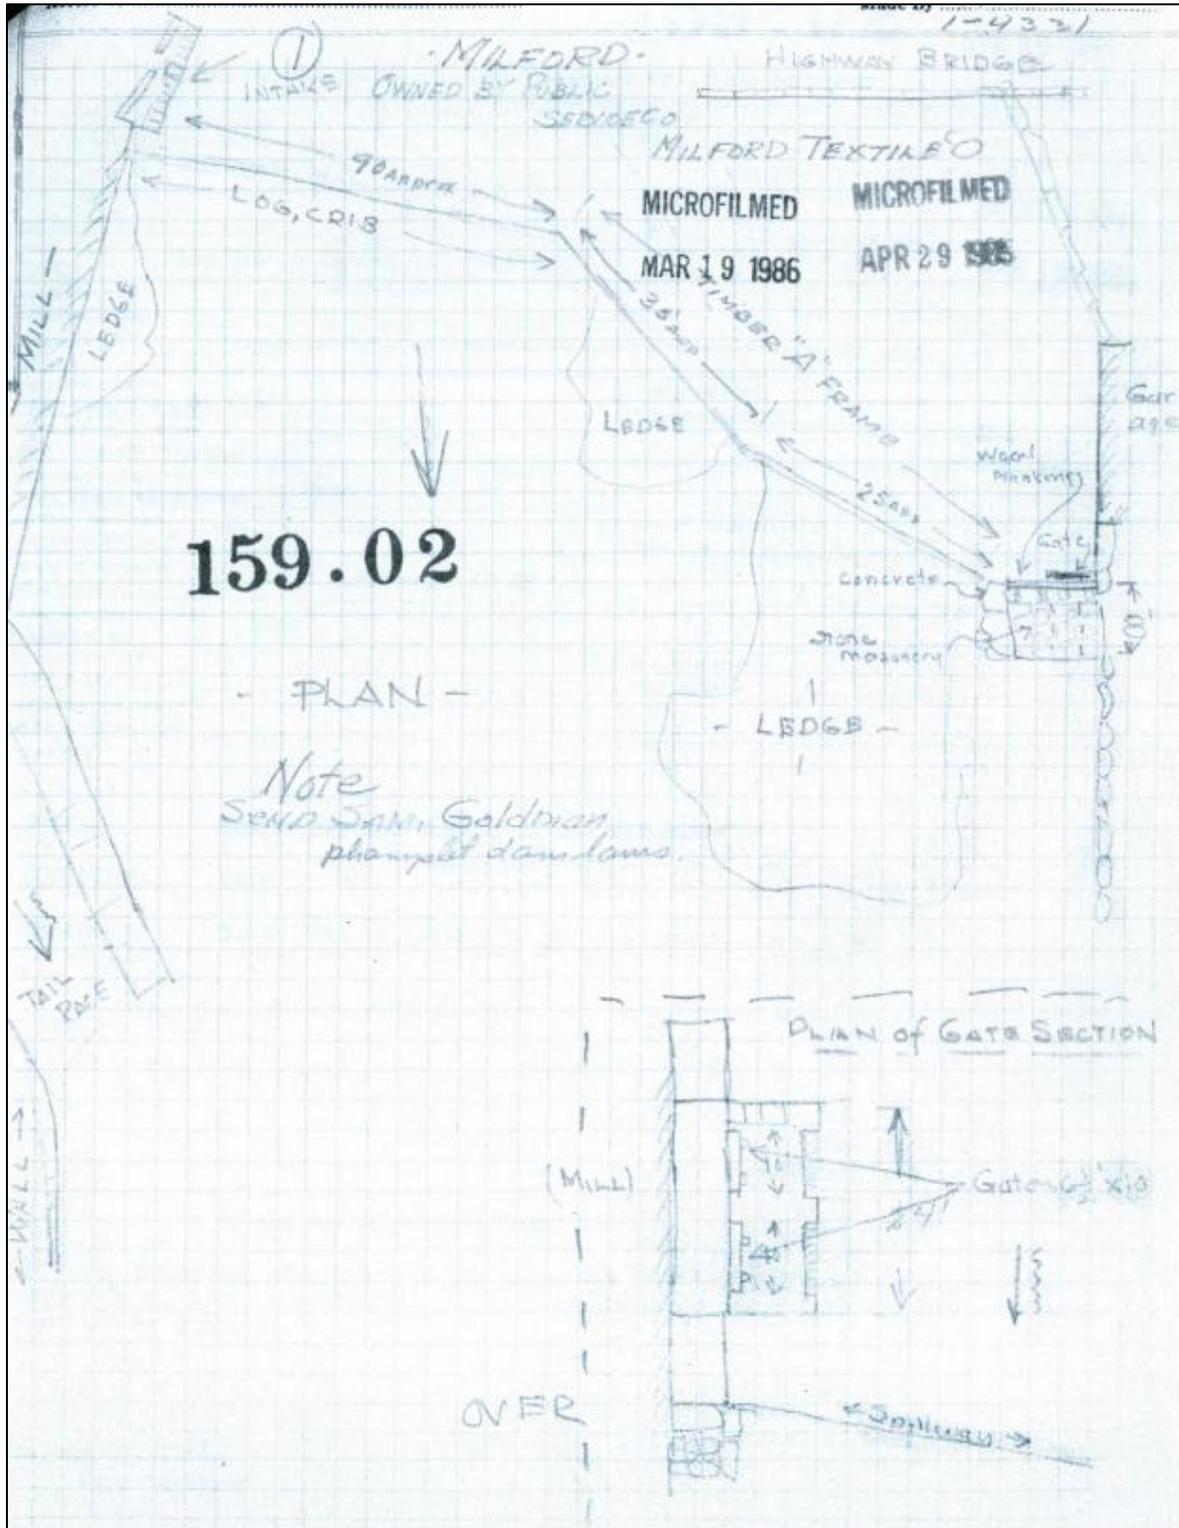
1935 sketch plan of Goldman Dam (source: New Hampshire DES – Department of Water Resources Dam Bureau File for the Goldman Dam [Dam No. 159.02]).
